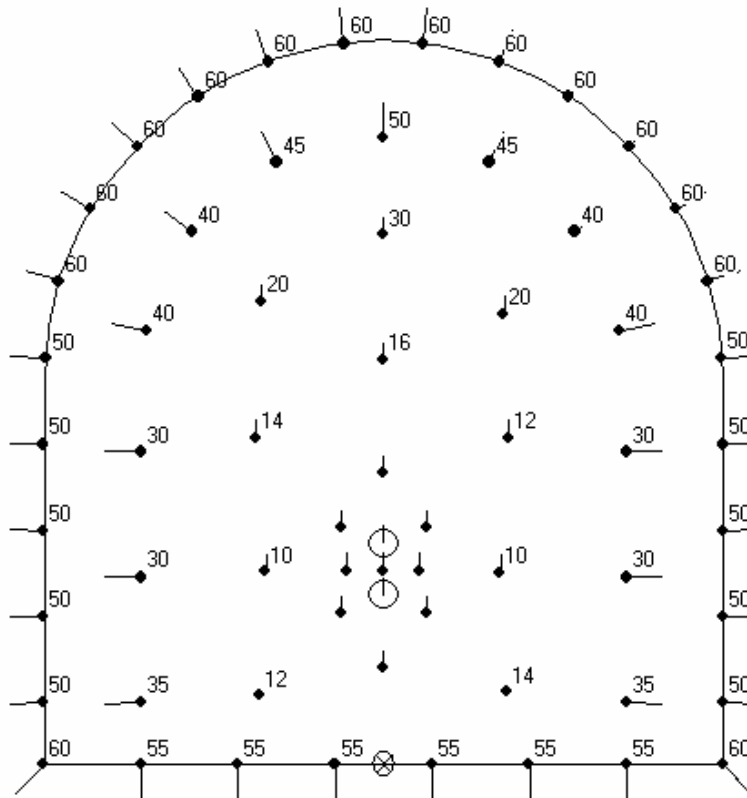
Drilling and firing pattern for a 30 m² tunnel in rock mass with poor blastability.
